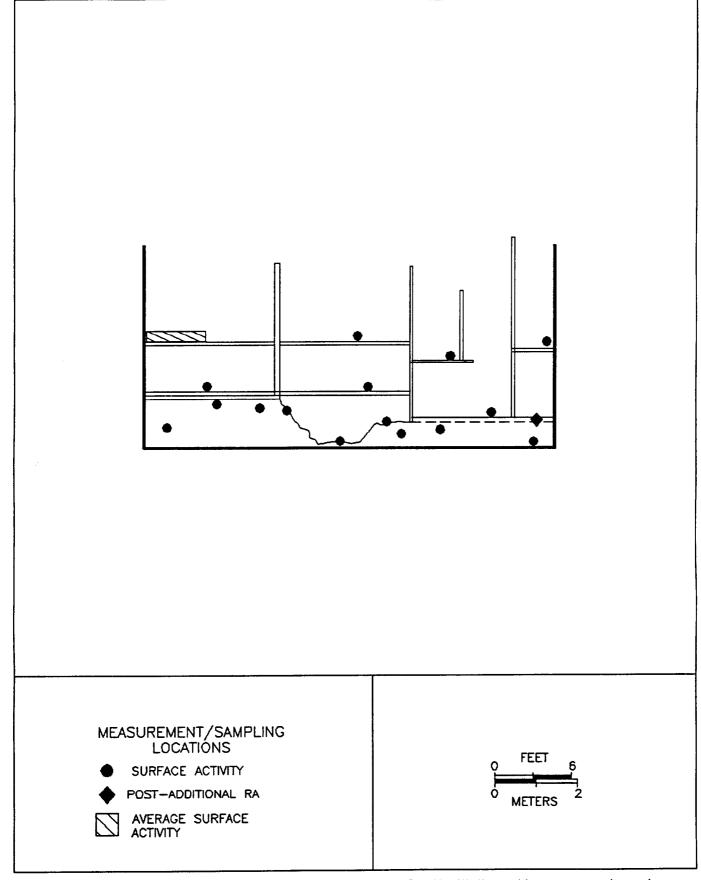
Building 8, Compressor Room, South Wall — Measurement and Sampling Locations
